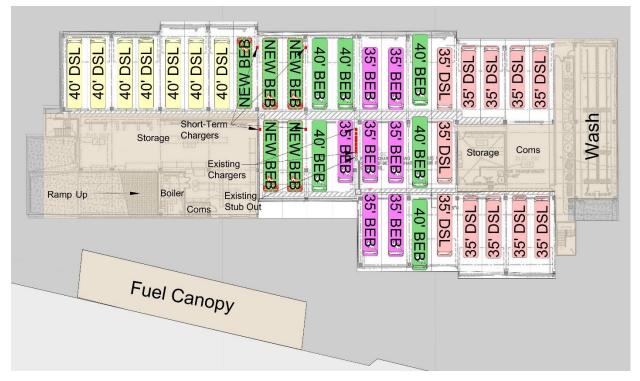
Close-Up of Charger Layout in Garage of Iron Horse Facility
